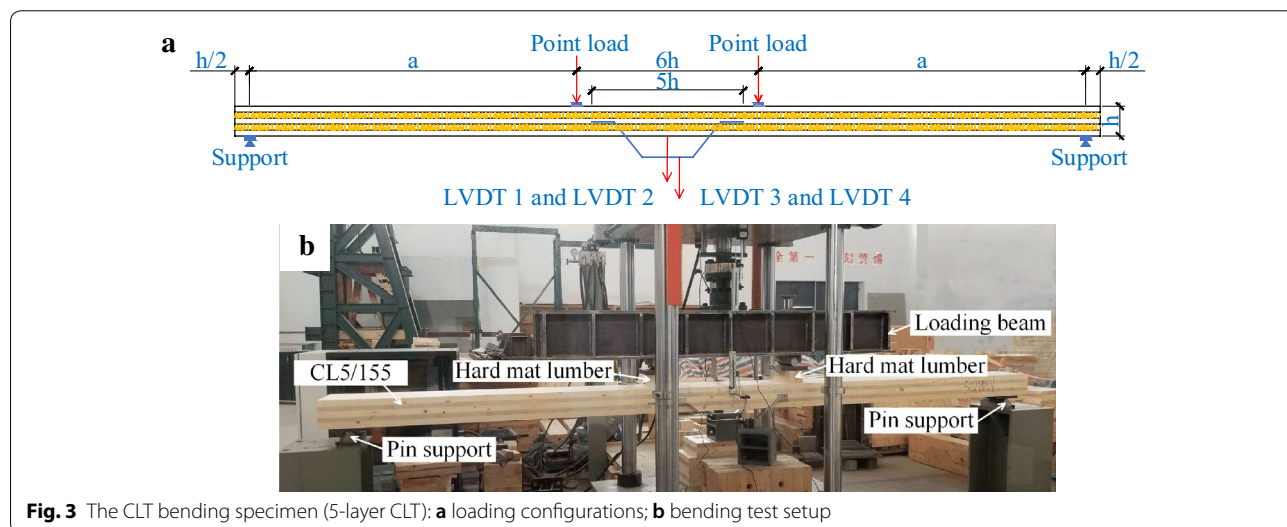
The CLT bending specimen (5-layer CLT): a loading configurations; b bending test setup
